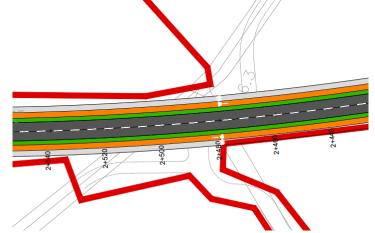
Intersection of Existing Routes and Proposed Main Road
